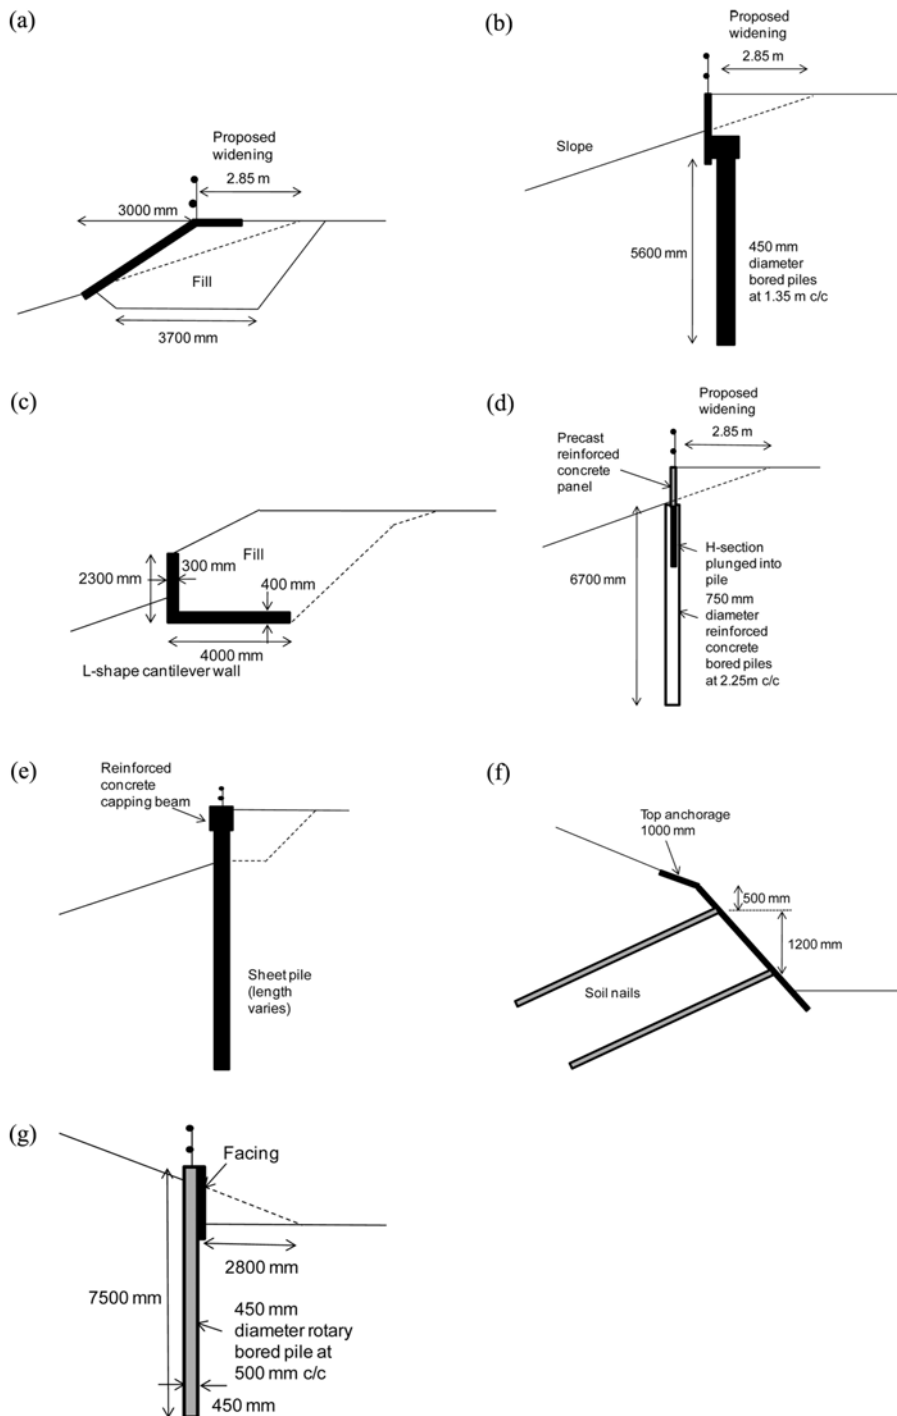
Soil Retention Options: (a) Granular Wedge, (b) Bored Spaced Pile Wall, (c) L-shaped Cantilever Wall, (d) Bored Space H-section Pile Wall, (e) Embedded Sheet Pile Wall, (f) Soil Nailing, (g) Contiguous Bored Pile Wall
